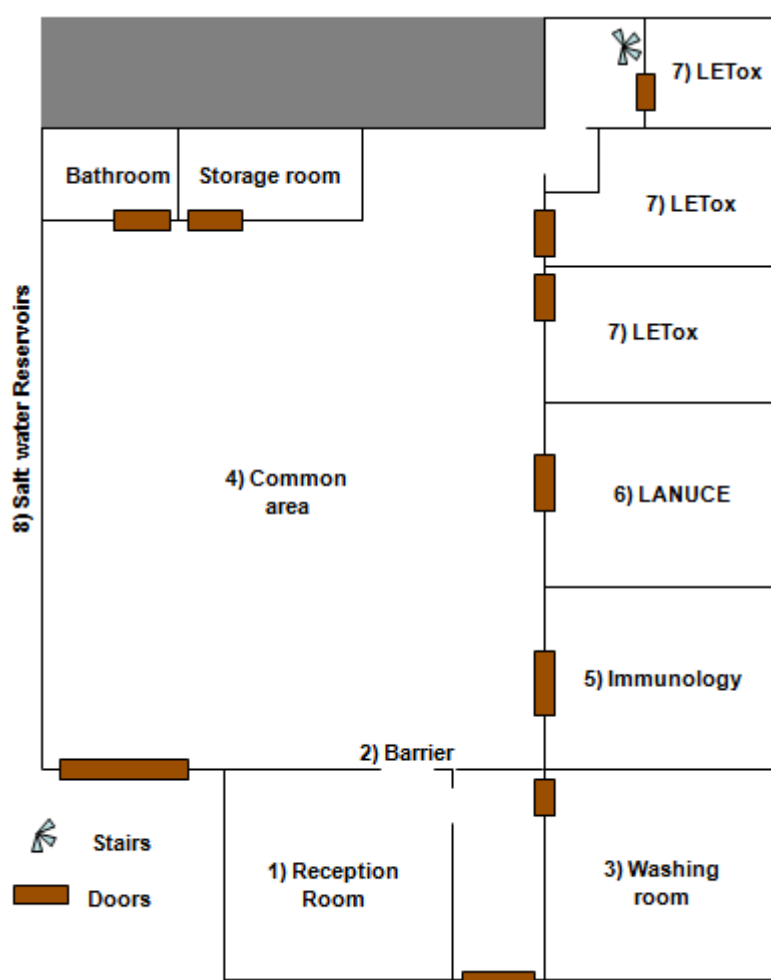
Plant from the ground floor of the BOGA CIIMAR building.
